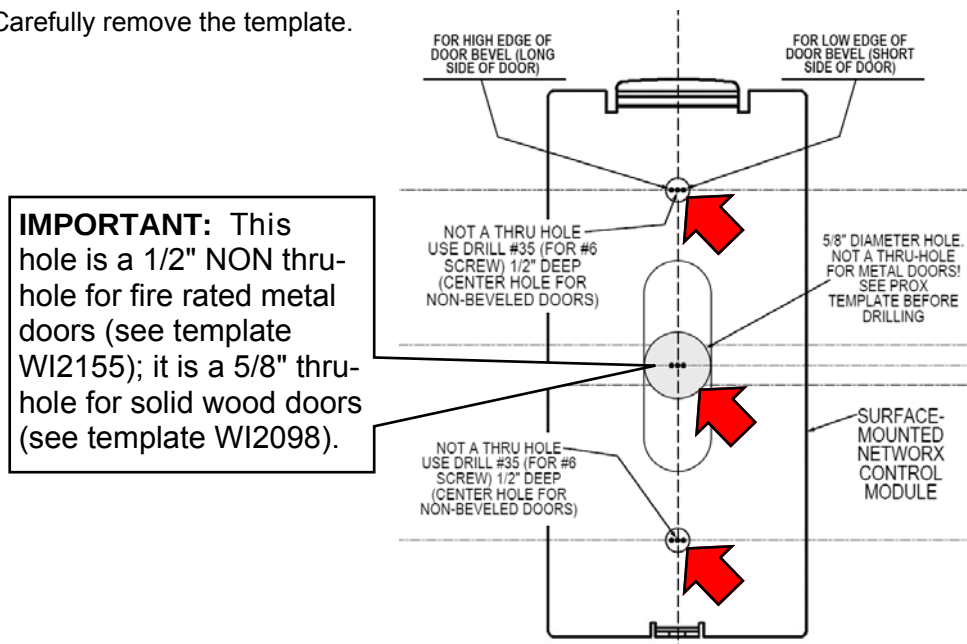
MARK THE TWO "CONTROL UNIT MOUNTING PLATE" HOLES (ARROWS)
